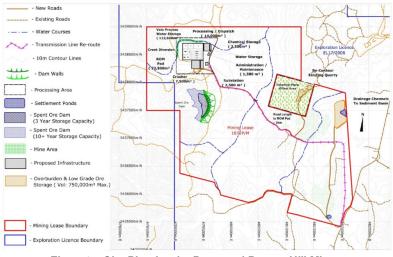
Site Plan for the Proposed Barnes Hill Mine
